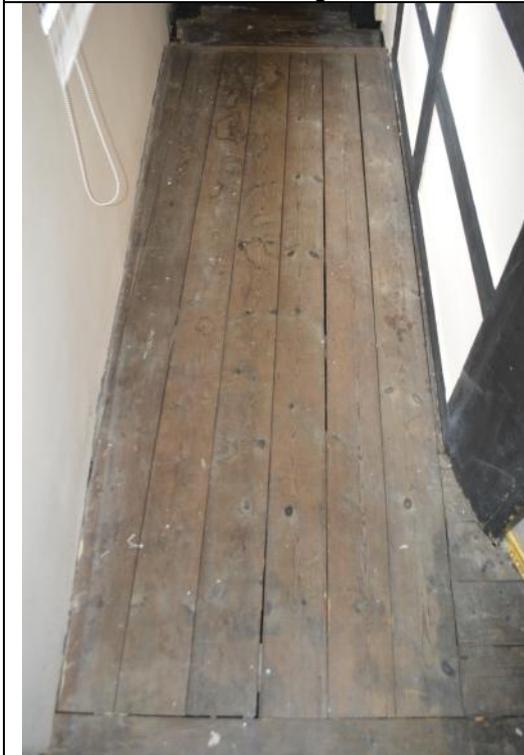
The corridor just north of the block 4 addition, its flooring indicative of the in-fill of a former staircase location
